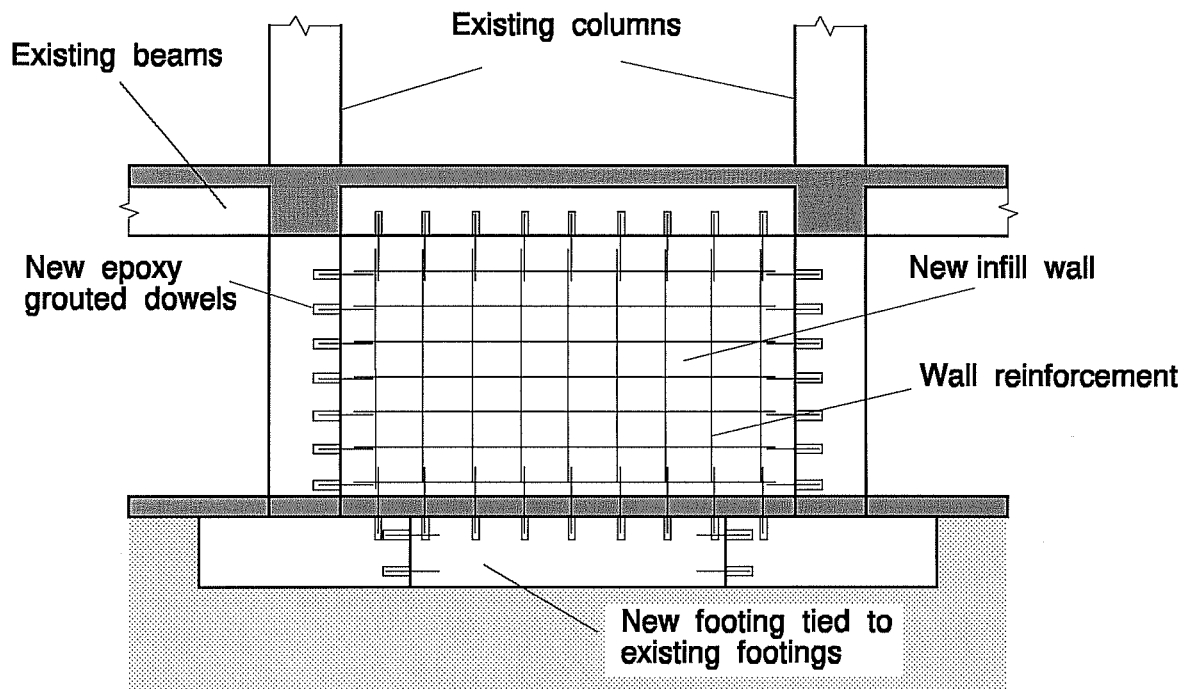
Strengthening of an existing concrete frame building with a reinforced concrete infill panel (adopted from Ref. 63.)
